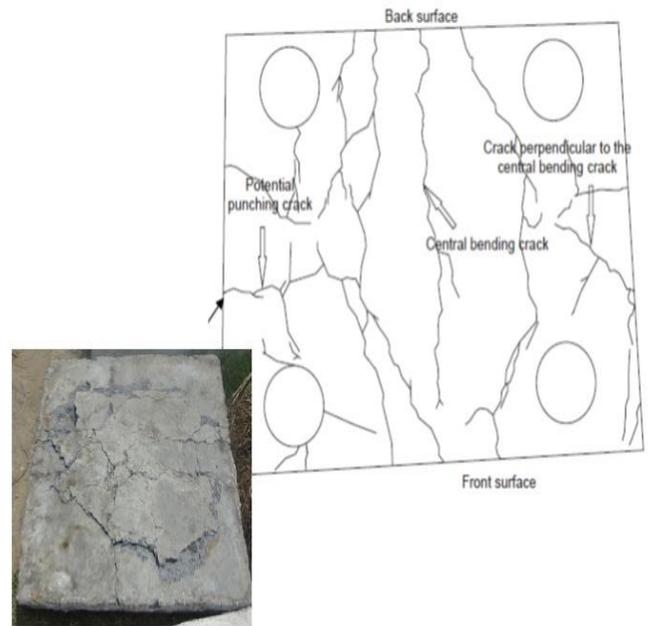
Crack distribution on PC-1A cap soffit at failure step
